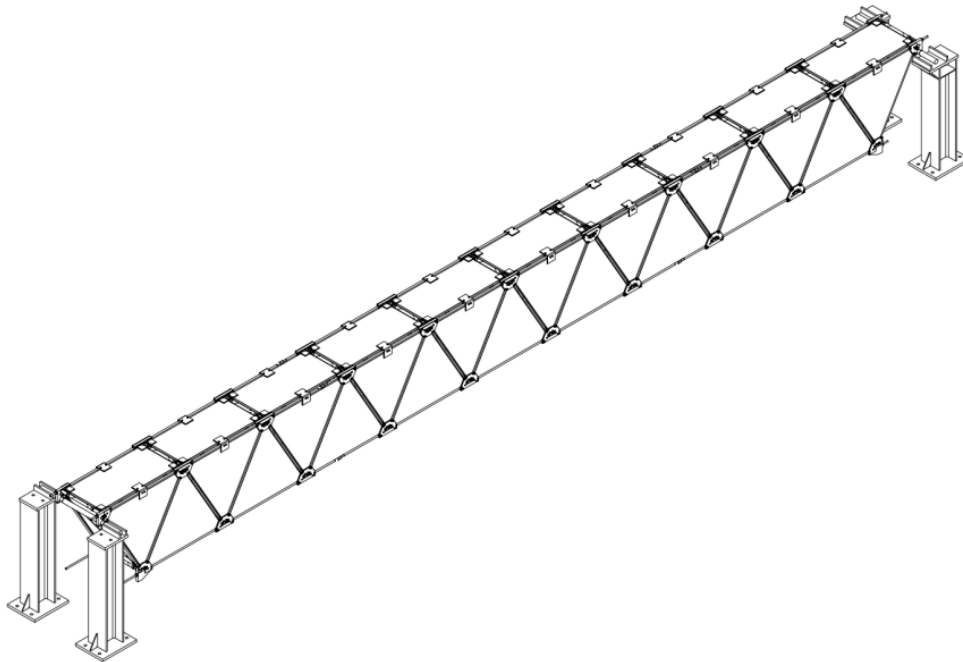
Isometric drawing of the 12 m prototype TVTy.
